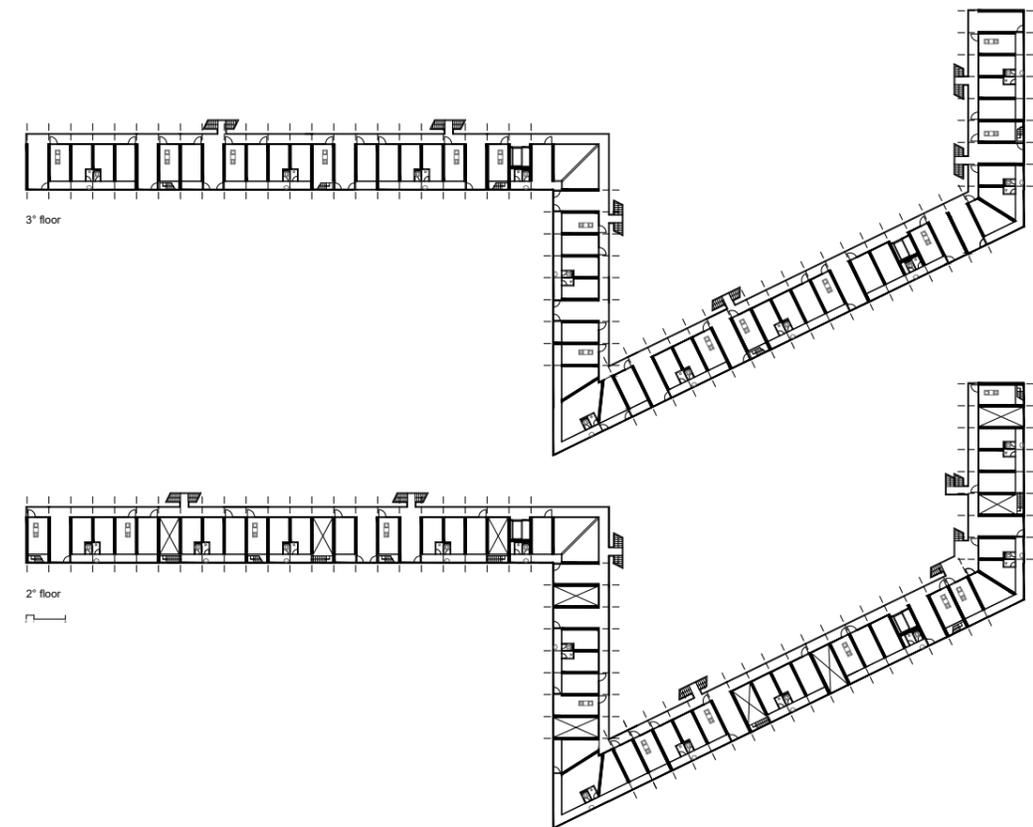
Gifu Kitagata Apartments typical floor plans
